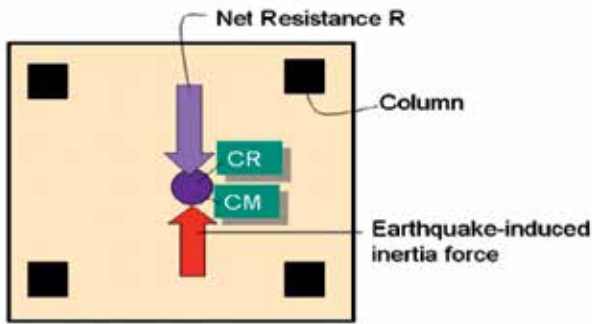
Plan of Symmetrical Building with Centres of Resistance and Mass Coinciding
